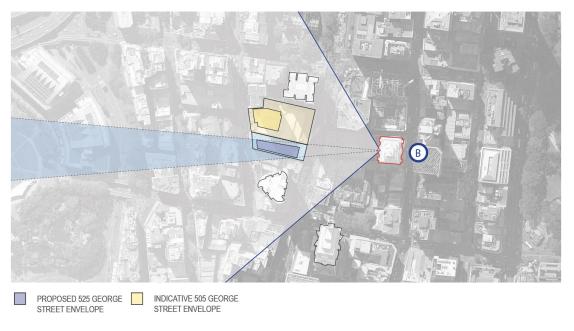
View B. View Plan - 343-357 Pitt Street, Century Tower
